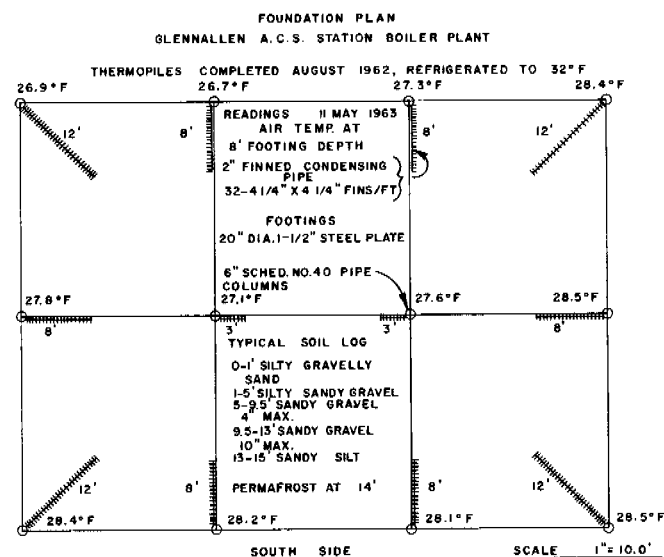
Foundation plan of ACS station boiler plant at Glennallen
